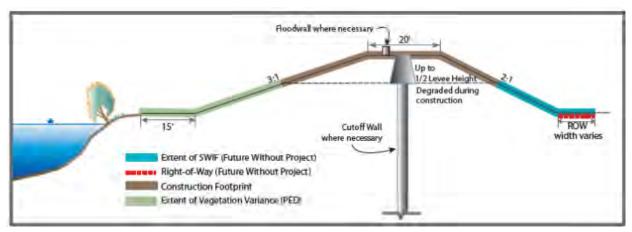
Conventional Open Trench Cutoff Wall or Floodwall Scenario.
